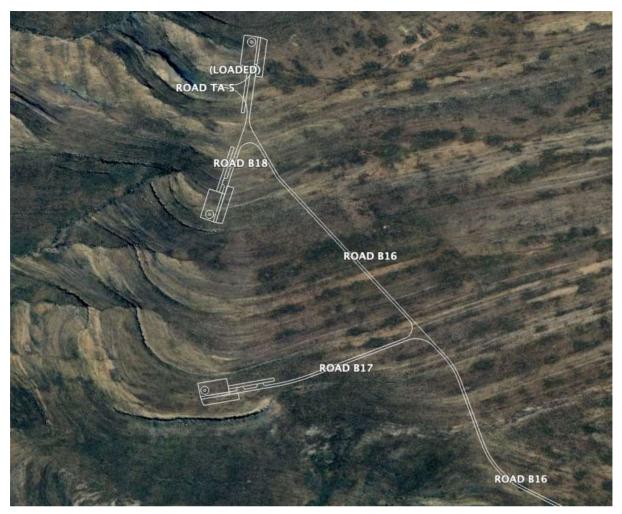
Proposed new layout and removal of the southern road option for road B16
